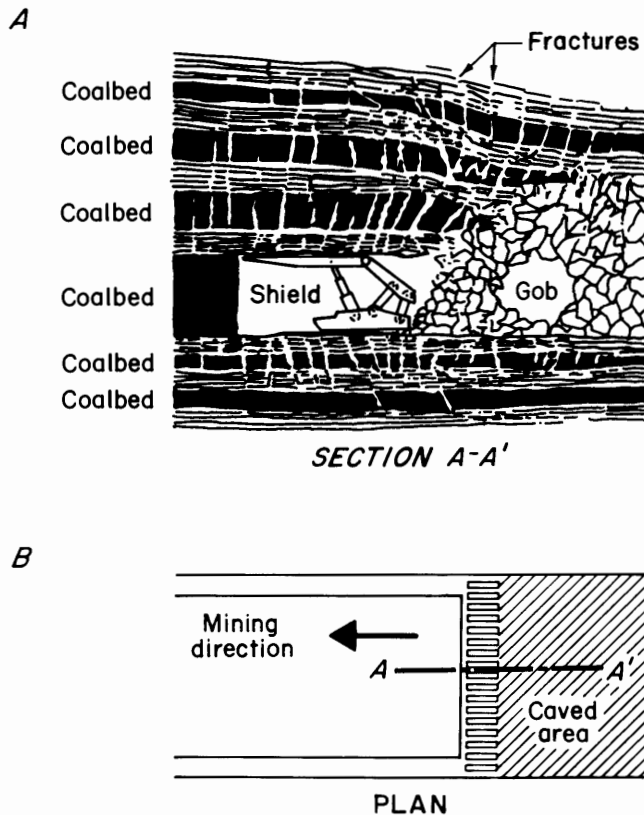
Schematic section view of longwall mining with gob gas conduits (A) and plan view of longwall panel (B) (9).
